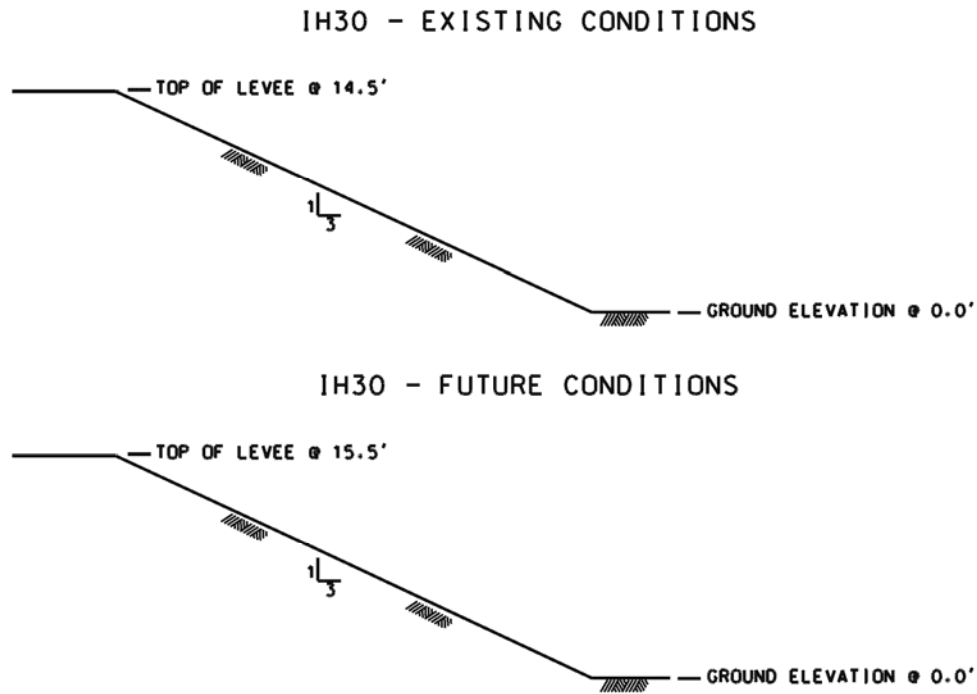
Typical Levee Design Cross-Section – Transition reach at IHNC (IH30) for existing (upper panel) and future conditions (lower panel).
